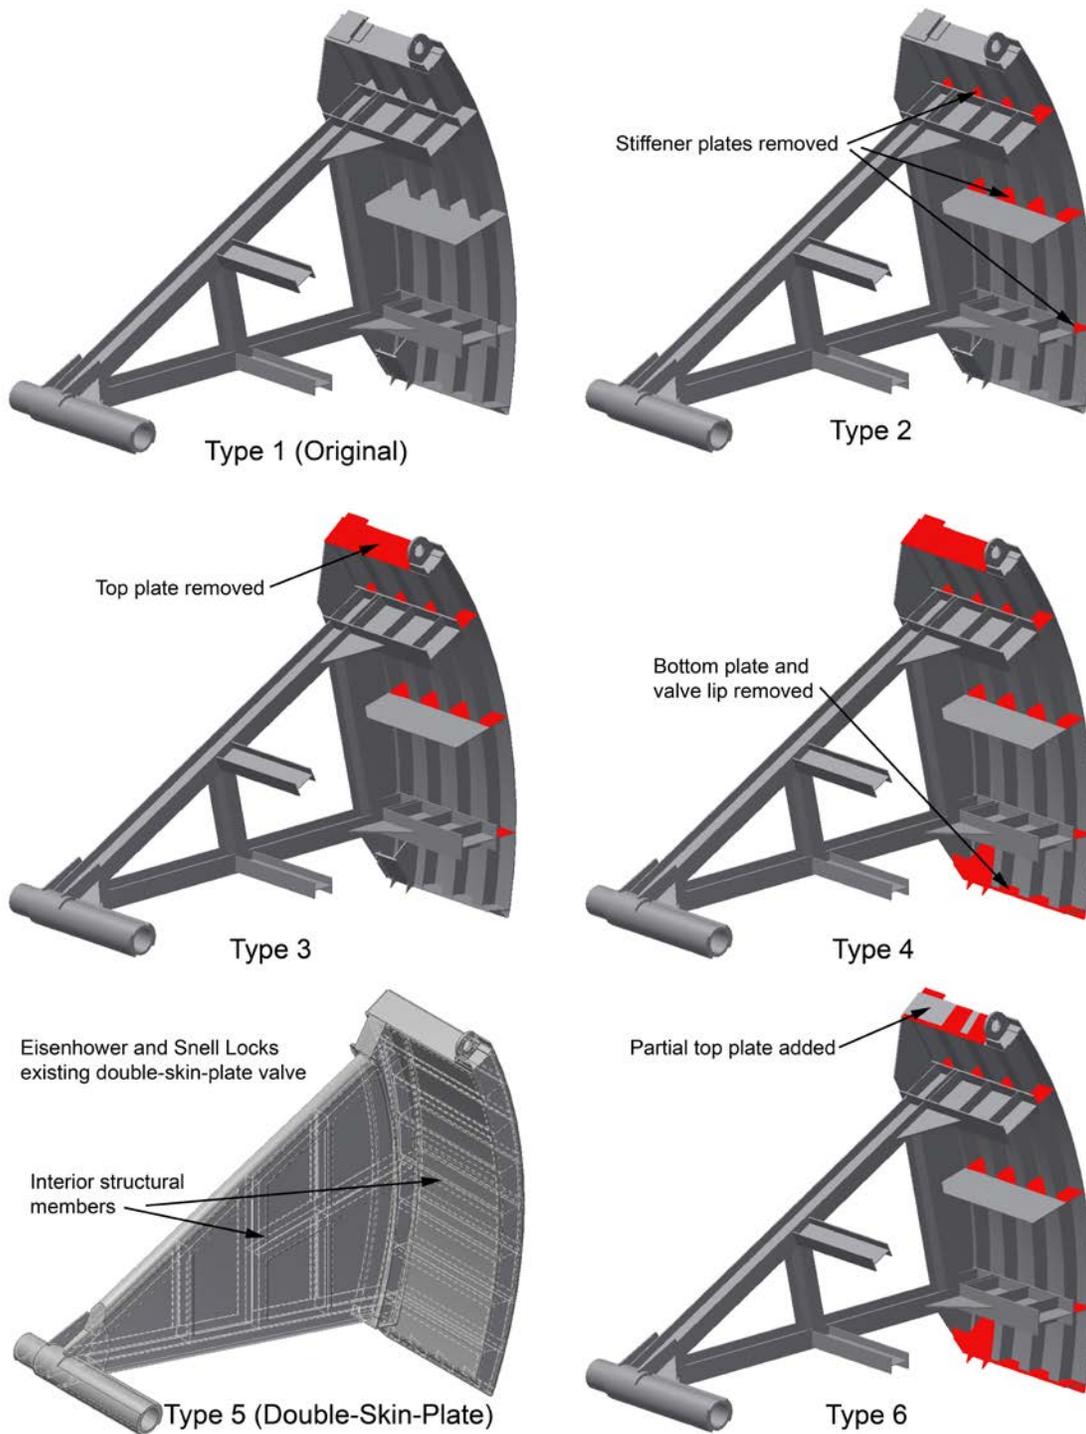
Tainter Valves, Snell Lock, Type 1-6 Designs.
